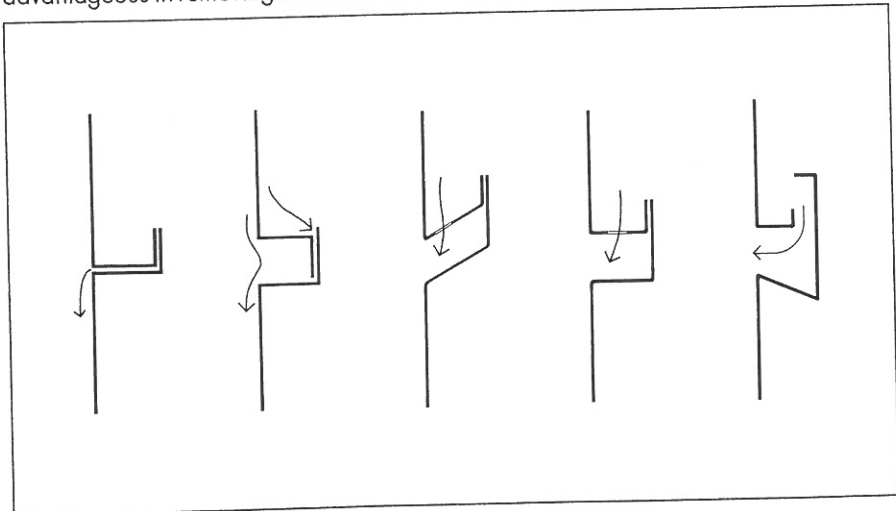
Water that flows on the outer surface of the panel must be prevented from getting behind the panel, and water that has penetrated behind the panel must be routed away. It is recommended to use a joint in which water that runs along the lower panel's inwardly inclined surface is routed down along a vertical joint when below the panel cladding there are surfaces which may suffer from run-off. Schematic drawing
